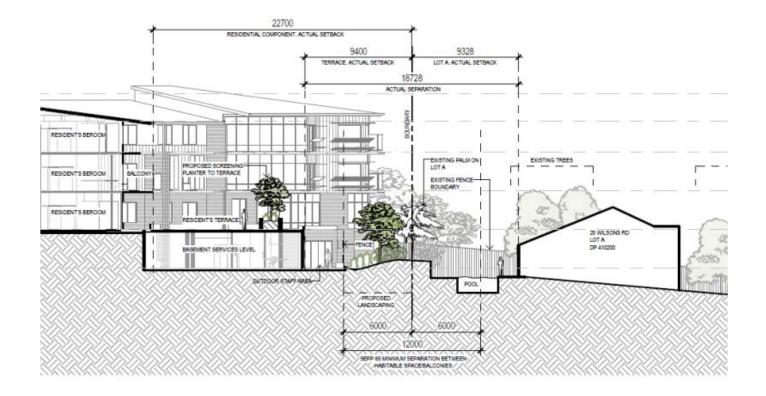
Cross-section from development over the balcony to the adjoining dwelling at H/No. 25 Wilsons Road
